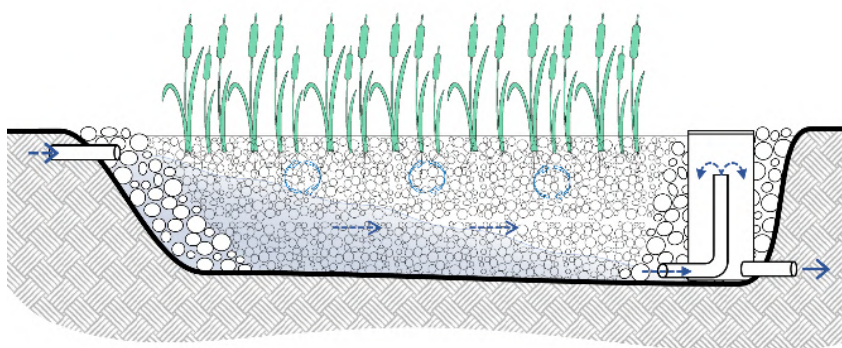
A schematic cross section of typical Subsurface flow constructed wetland (By Author)
